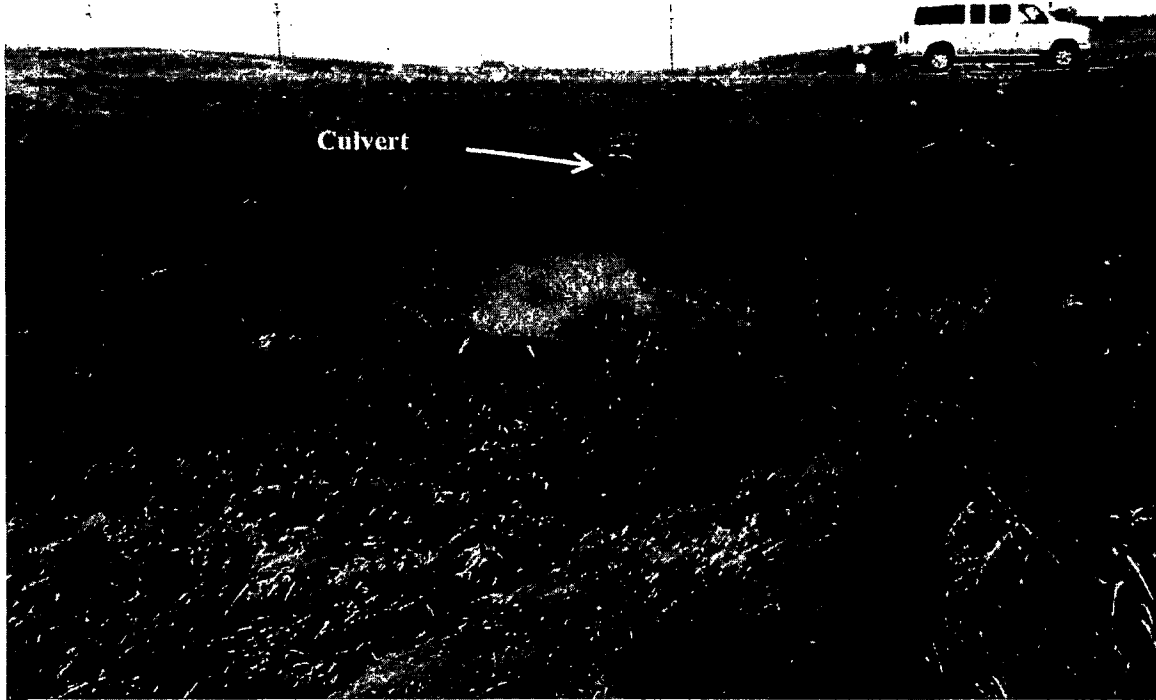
Sediment accumulation in front of culvert covered with tumbleweed.
